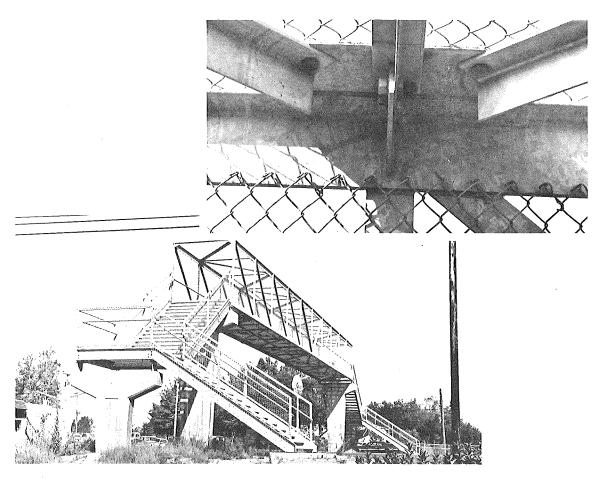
General appearance of P01 of 52042 (south stairs in foreground). Truss is 92-1/2 ft long. The close-up, at upper right, of sidewall and roof juncture, shows some bolted and some welded T-members.
